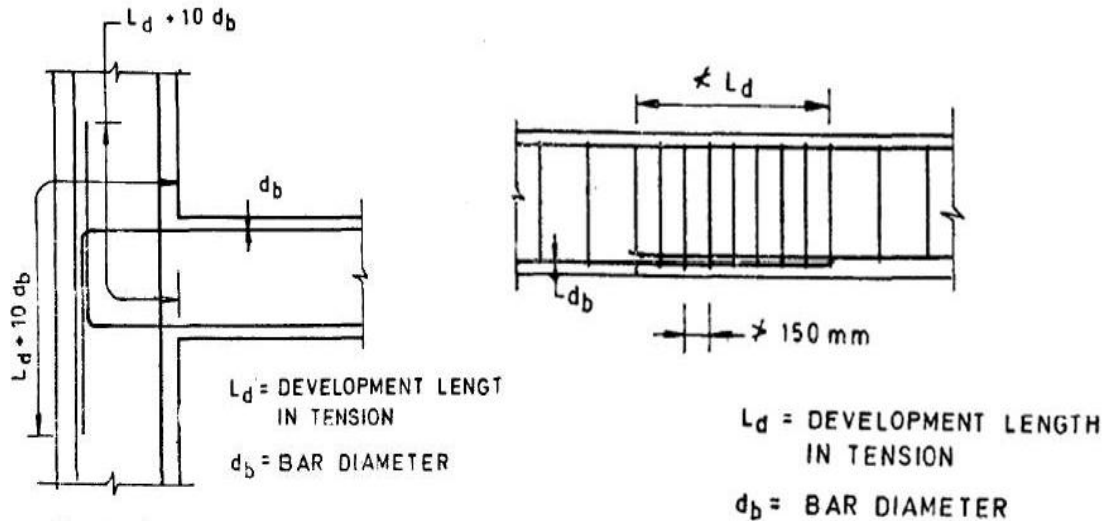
ANCHORAGE OF BEAM BARS IN AN
